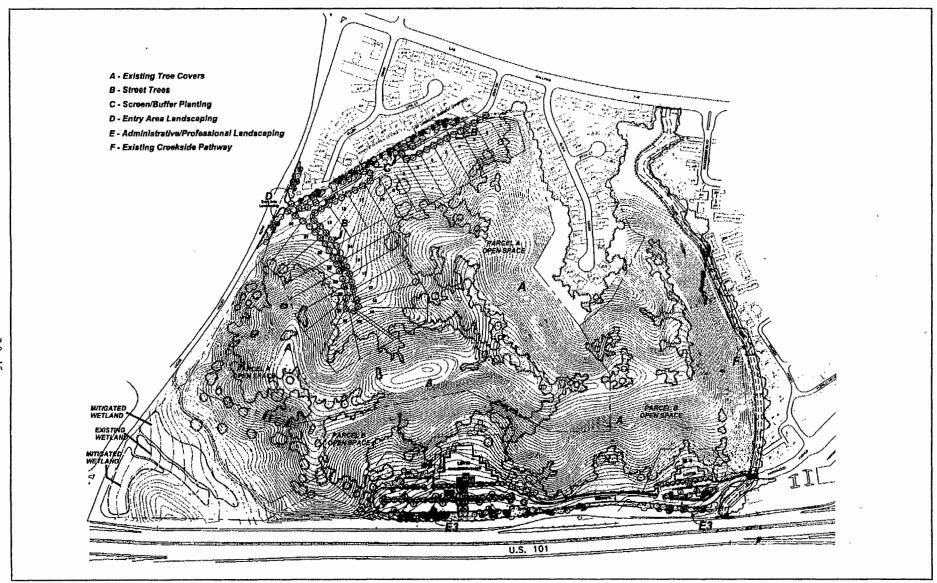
CONCEPTUAL LANDSCAPE PLAN Oakview Master Plan
